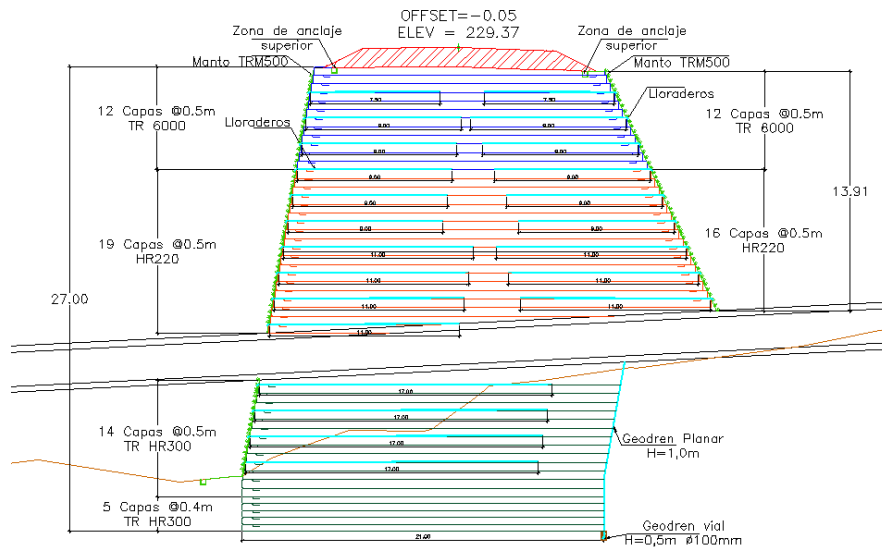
Critical Section of the Reinforced Soil Wall with box culvert
